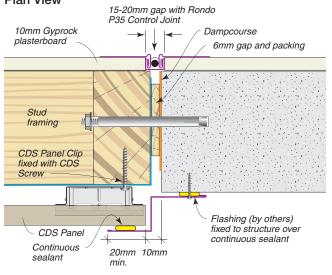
Junction of CDS with Offset Masonry Wall – Plan View
